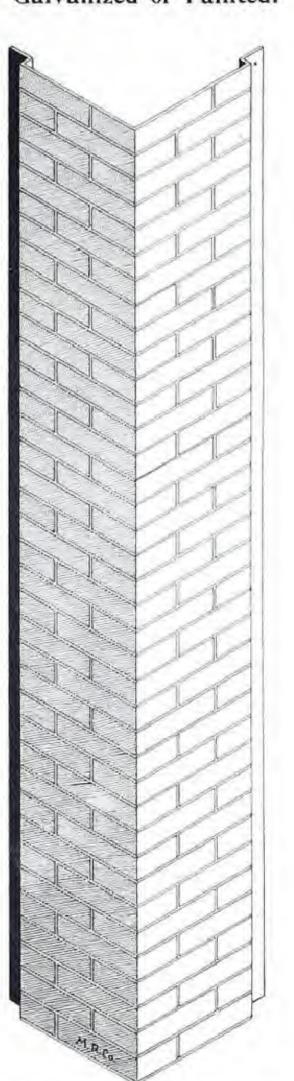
Made in lengths of 8 feet. Covering face, 13 x 13 inches. For use with Sheet-Steel Pressed Brick.
